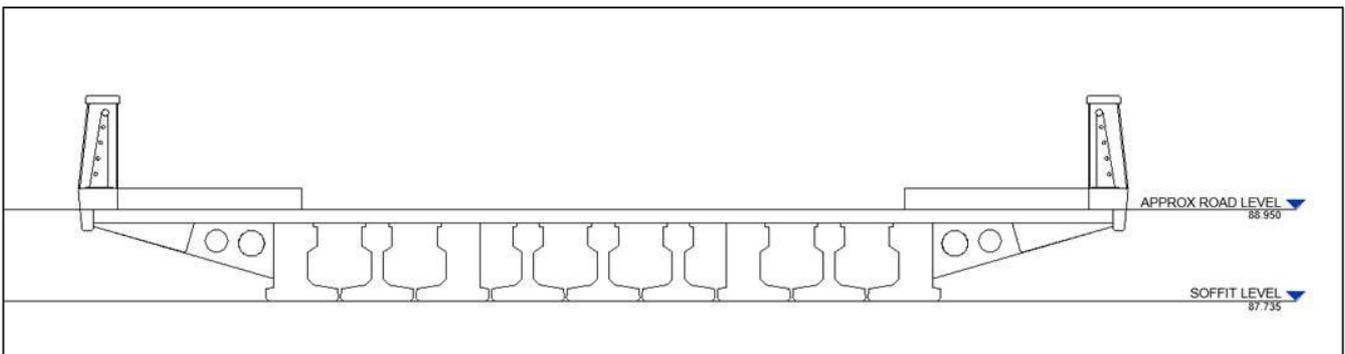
PROPOSED BRIDGE CROSS-SECTION.
